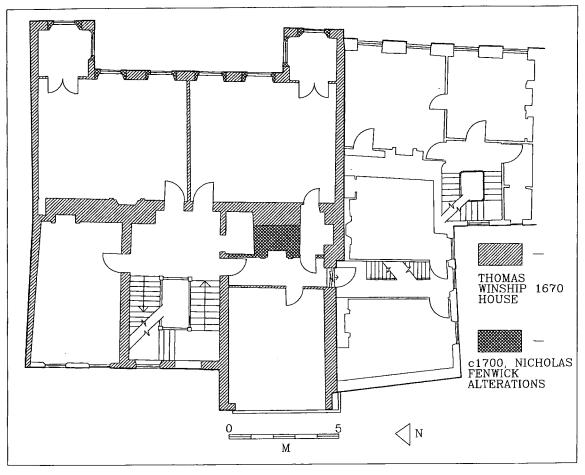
Alderman Fenwick's House: Second Floor Plan.
